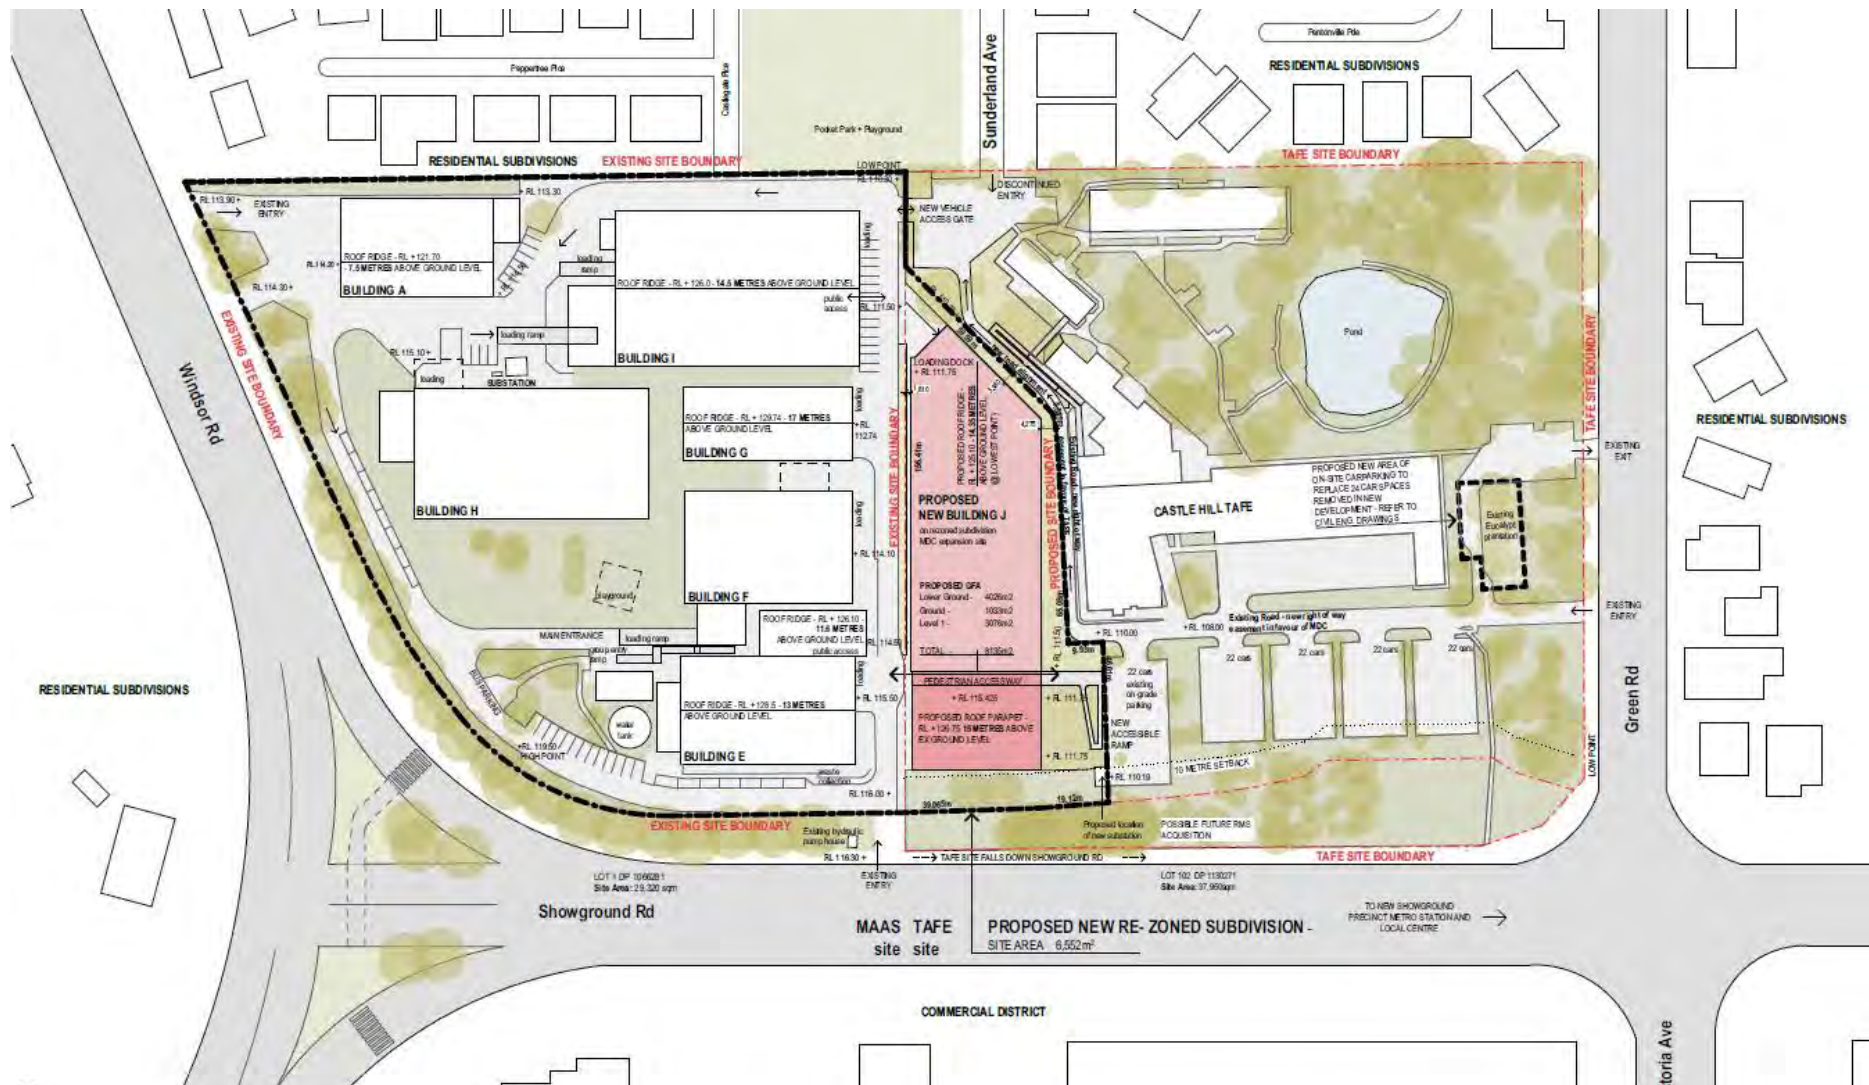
Proposed Site Plan (Lahznimmo Architects, DA1101, Rev.12, 7.08.2020)
